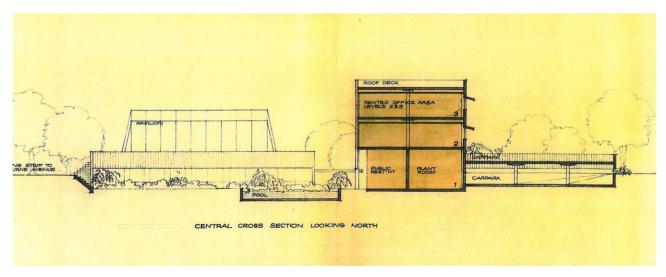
Boyd's original drawings of Churchill House – Central cross-section looking north (courtesy of Ann Cleary)
